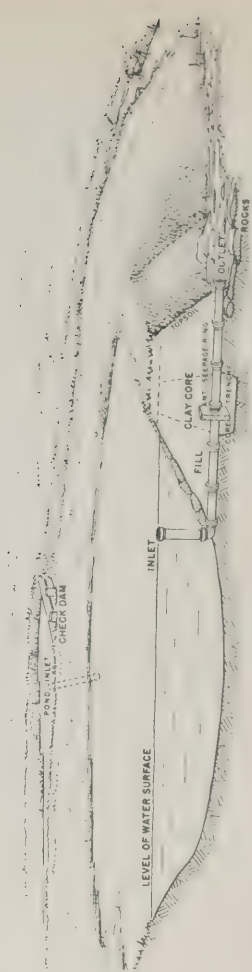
A section of the sketch shown in Figure 2 with details of earth dam construction and the inlet to the discharge pipe which controls the level of the pond. It should be further noted that the earth dam has a clay core and that the anti-seepage ring is a concrete block which prevents water seeping along the outside surface of the pipe.
